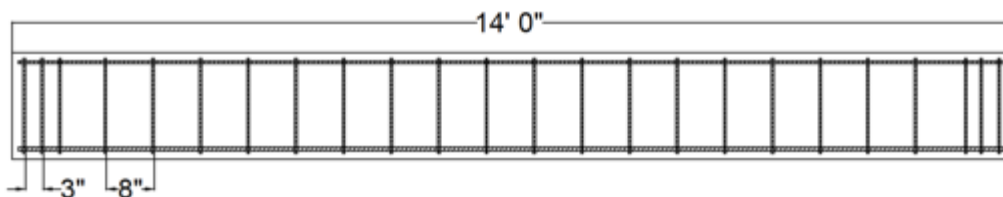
Full-Scale Control Beam Specimen Elevation
